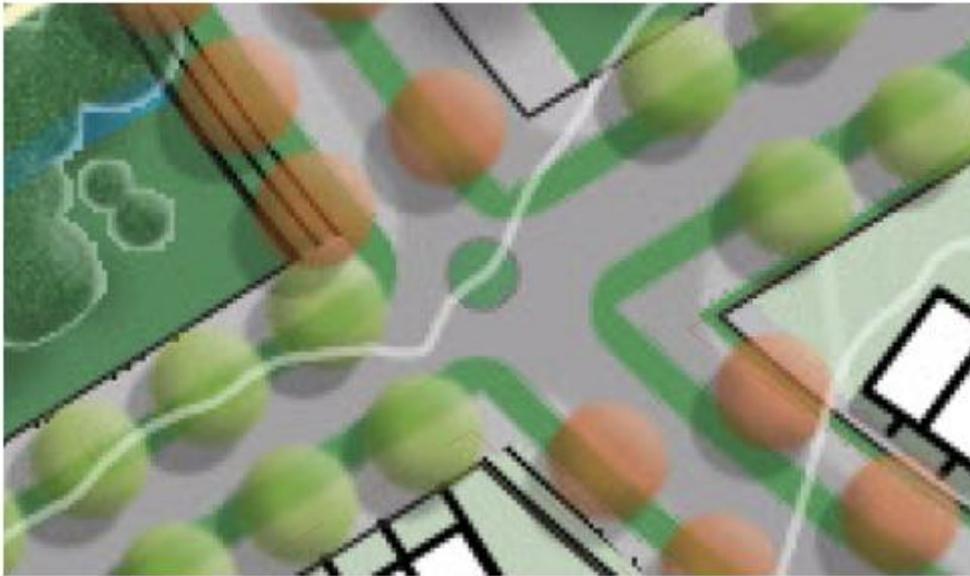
Excerpt from masterplan showing what appears to be a roundabout at one of the proposed crossroads intersections.
